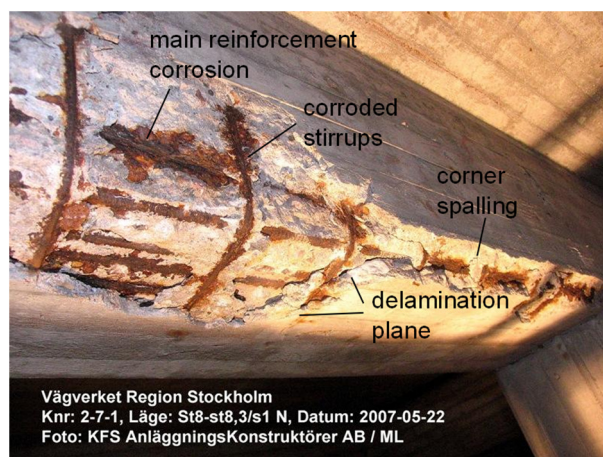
Delamination and corrosion of main bars and stirrups
